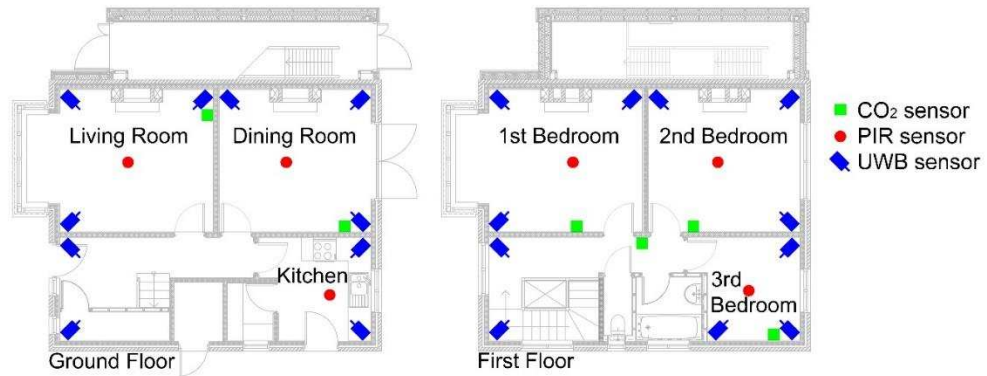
FLOOR PLANS OF THE HOUSE WITH CO₂, PIR AND UWB SENSORS
